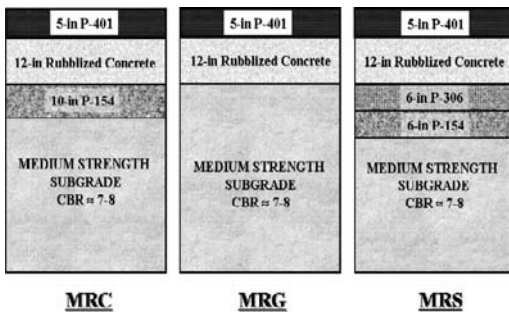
CC2 overlay pavement test sections (1 in. = 25 mm).
